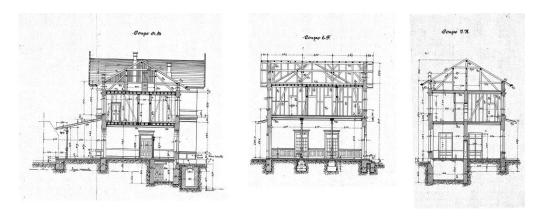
I^{st} class station building project drawn for Konya / Cross sections
